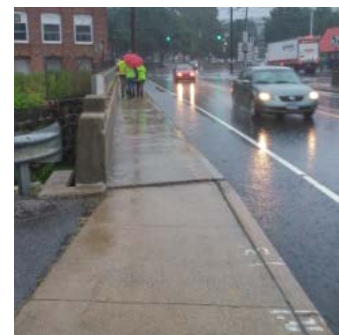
Uneven Sidewalk on Rowley Street looking North at Bridge over Mad River
